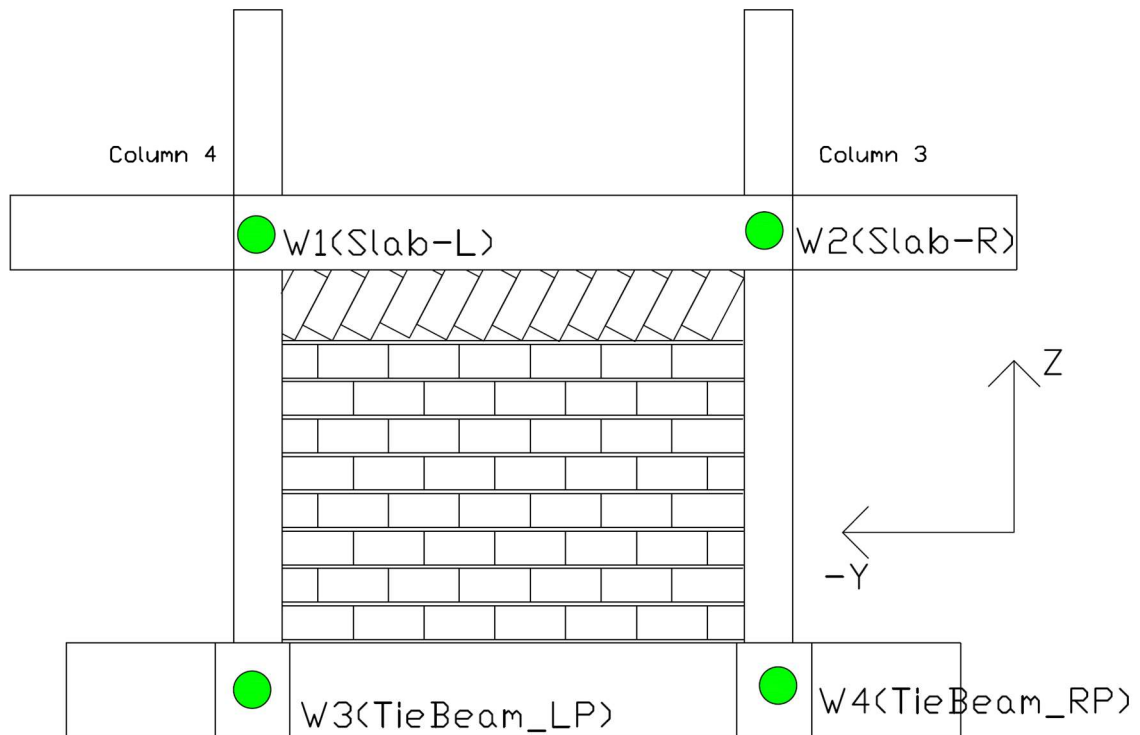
Position of the draw wire sensors on the concrete structure slab and foundation beams (specimen's view parallel to the direction of the seismic table movement)
